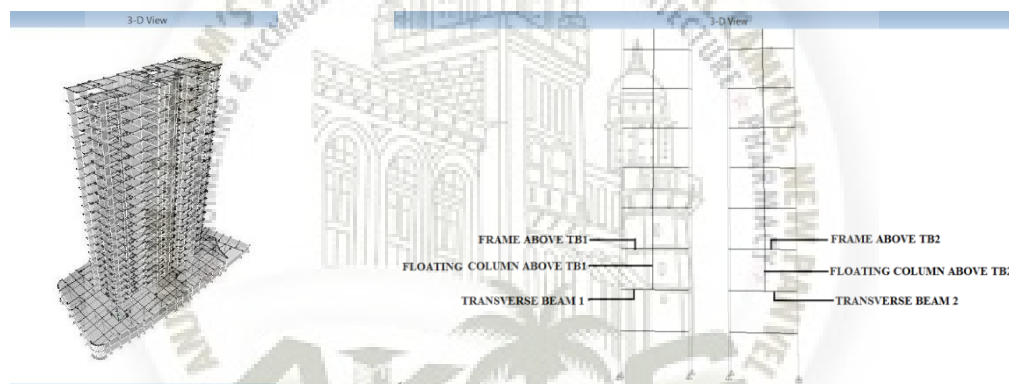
3D view of ETABS model Transverse beams and floating column⁽²⁾
